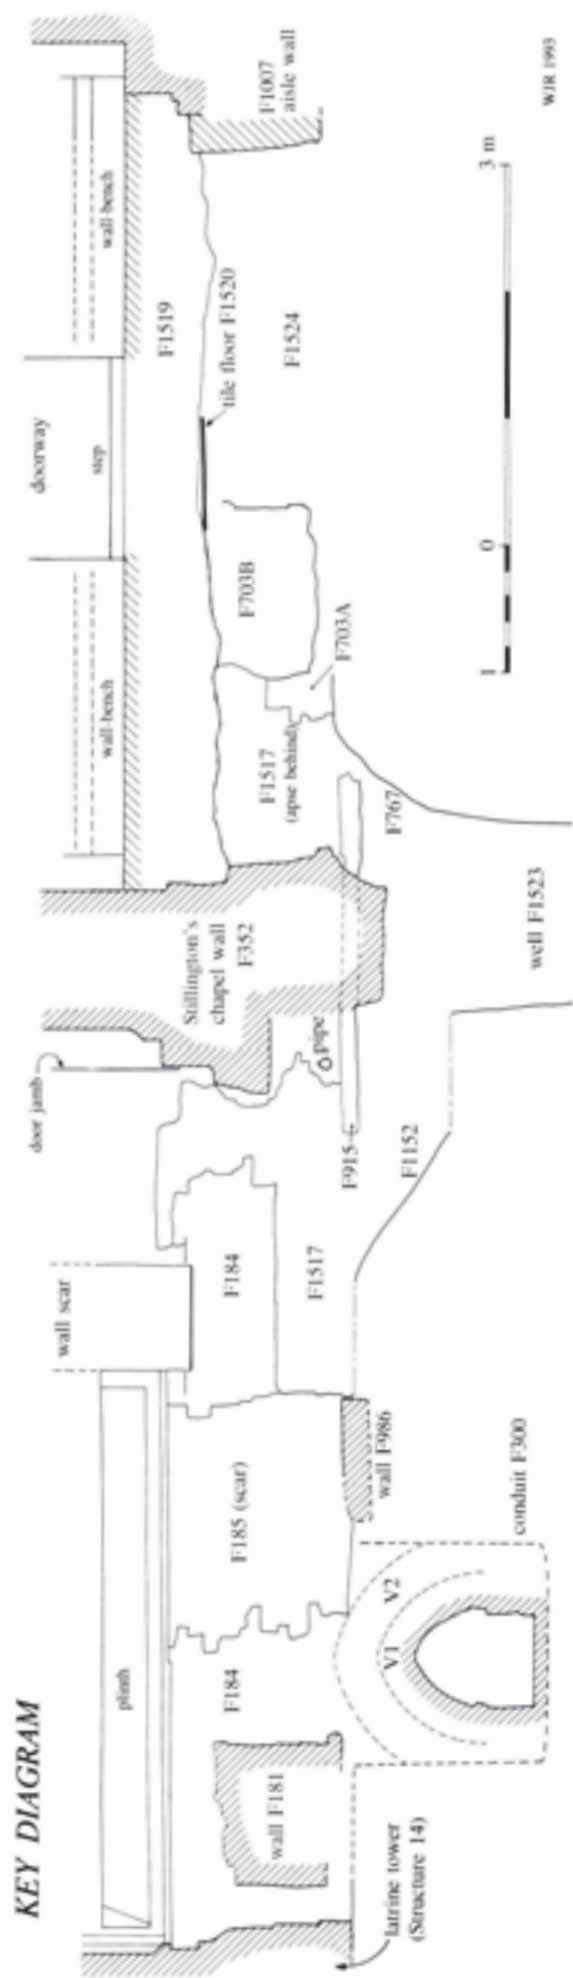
Elevation drawing and key diagram to the foundations of the east cloister wall and features directly beneath it. The Anglo-Saxon apse (F1522) is concealed by Stillington's wall (F352) and the masonry facing (F1517) which squared-off the apse. Scale 1:60
